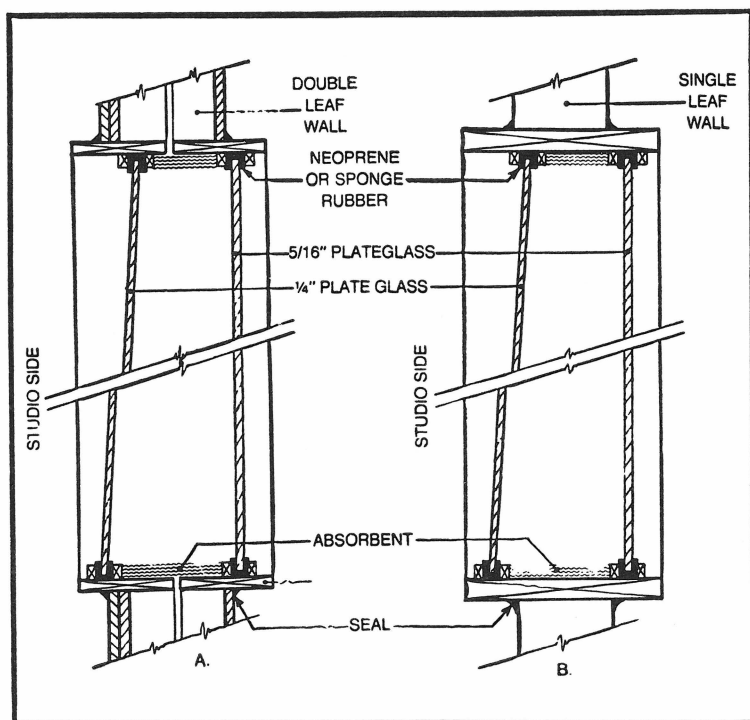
Plans for observation window having high transmission loss: (A) for a double leaf wall (staggered stud, double stud, or double masonry walls), and (B) for single leaf wall.
